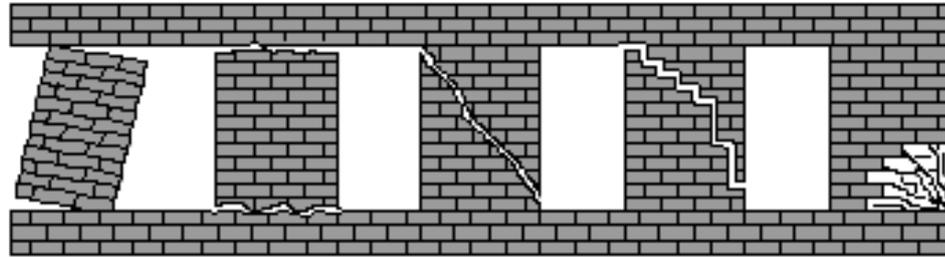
Typical failure modes of masonry walls, subjected to in-plane seismic load, (a) Rocking motion, (b) Frictional sliding, (c) Tensile unit cracking, (d) Compression failure, (Lourenço, 2008)
